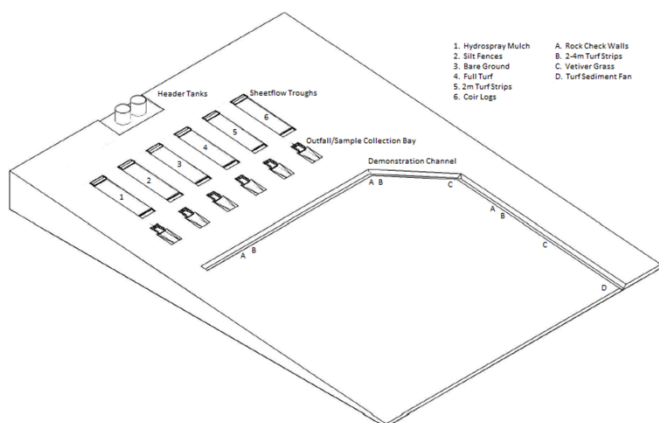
Plan of erosion bays and channel including water tanks collection trough and outfall bays.
